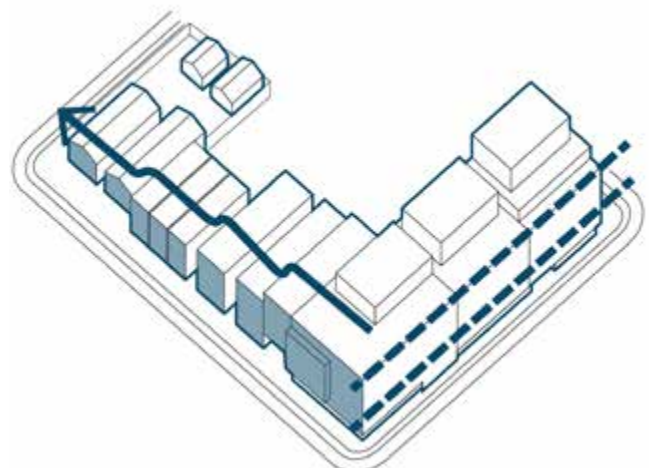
Transition of building height to lower existing buildings to avoid out-of-scale built form and maintain street height on key streets.
